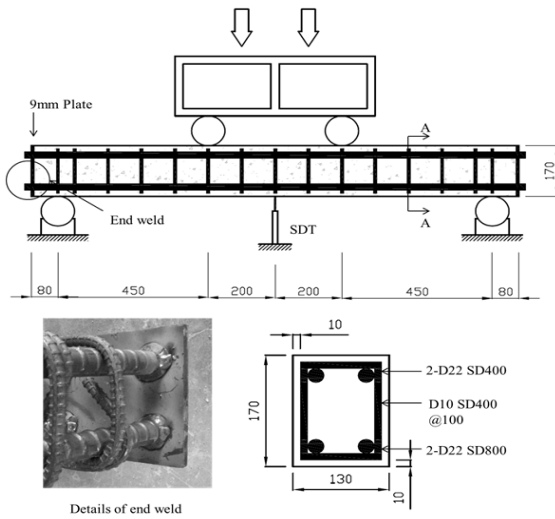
Configuration and reinforcement detail of specimens (unit : mm)
